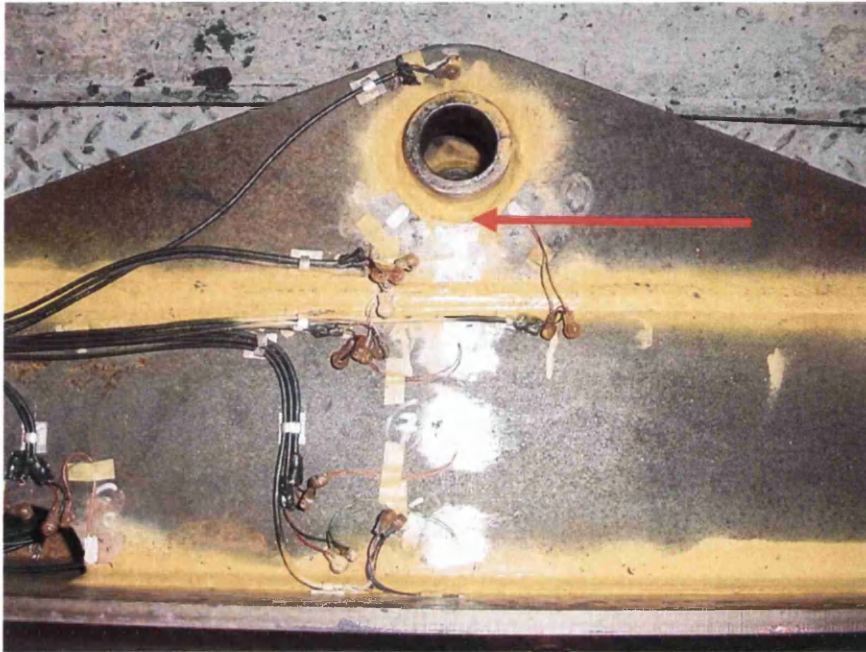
Test component sample 1 crack location - base of outside weld toe
